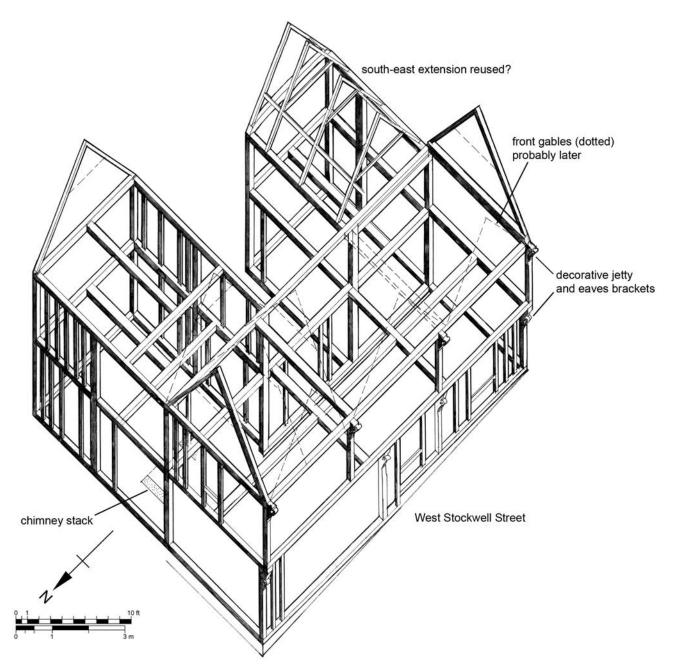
Isometric view of 29–31 West Stockwell Street (corpus no. 104)
